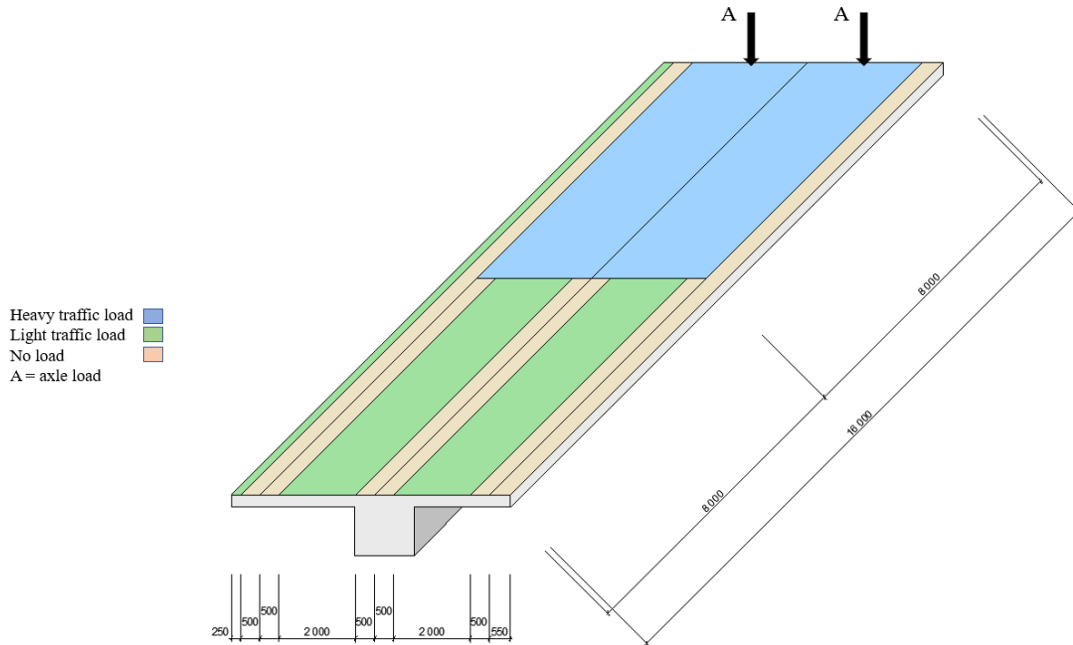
Traffic load placement in the bridge model. Measures are in mm.
